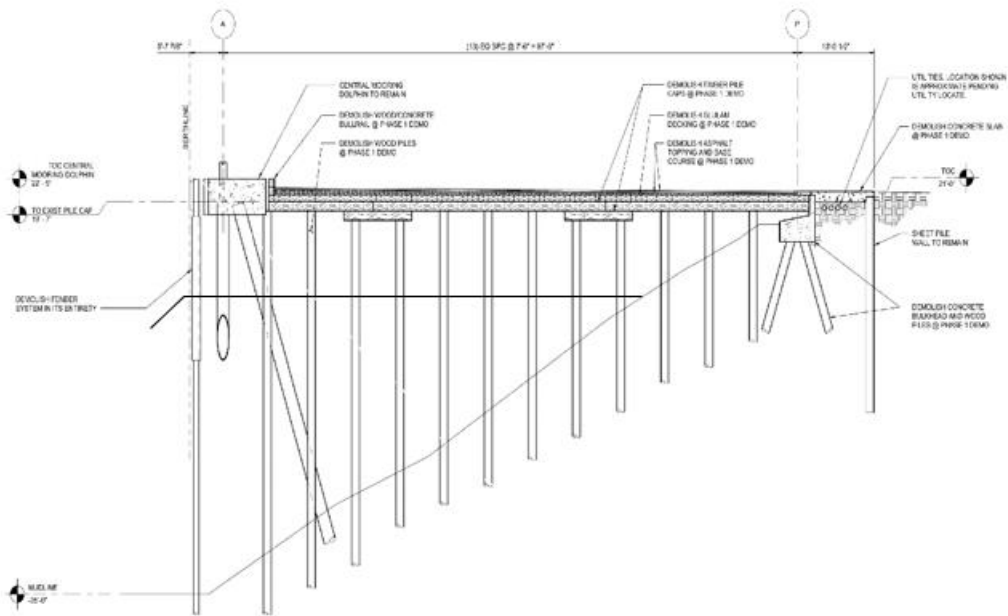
Profile of the existing dock and pile support structure at the Weyerhaeuser facility.
